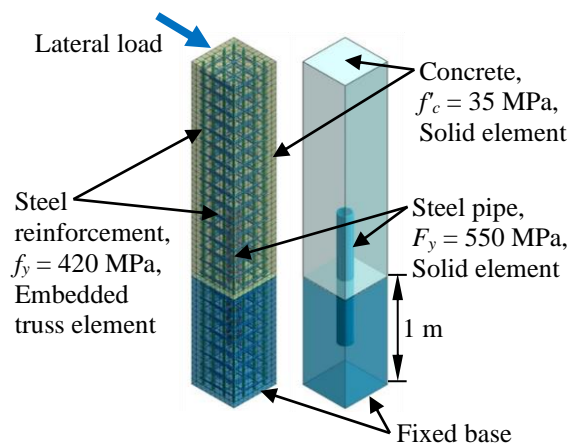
Finite element model of precast concrete column with mortise-tenon splice
